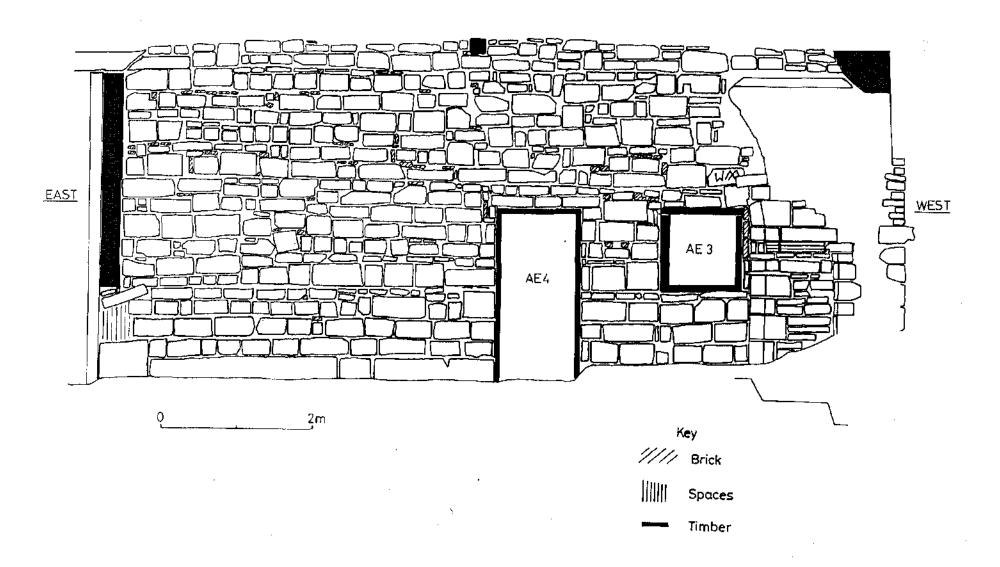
Structure 4. Detail of Stonework at West End of North Wall. (Sterenberg)
